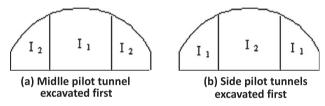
Excavation sequences of arch roof layer of underground powerhouse.
